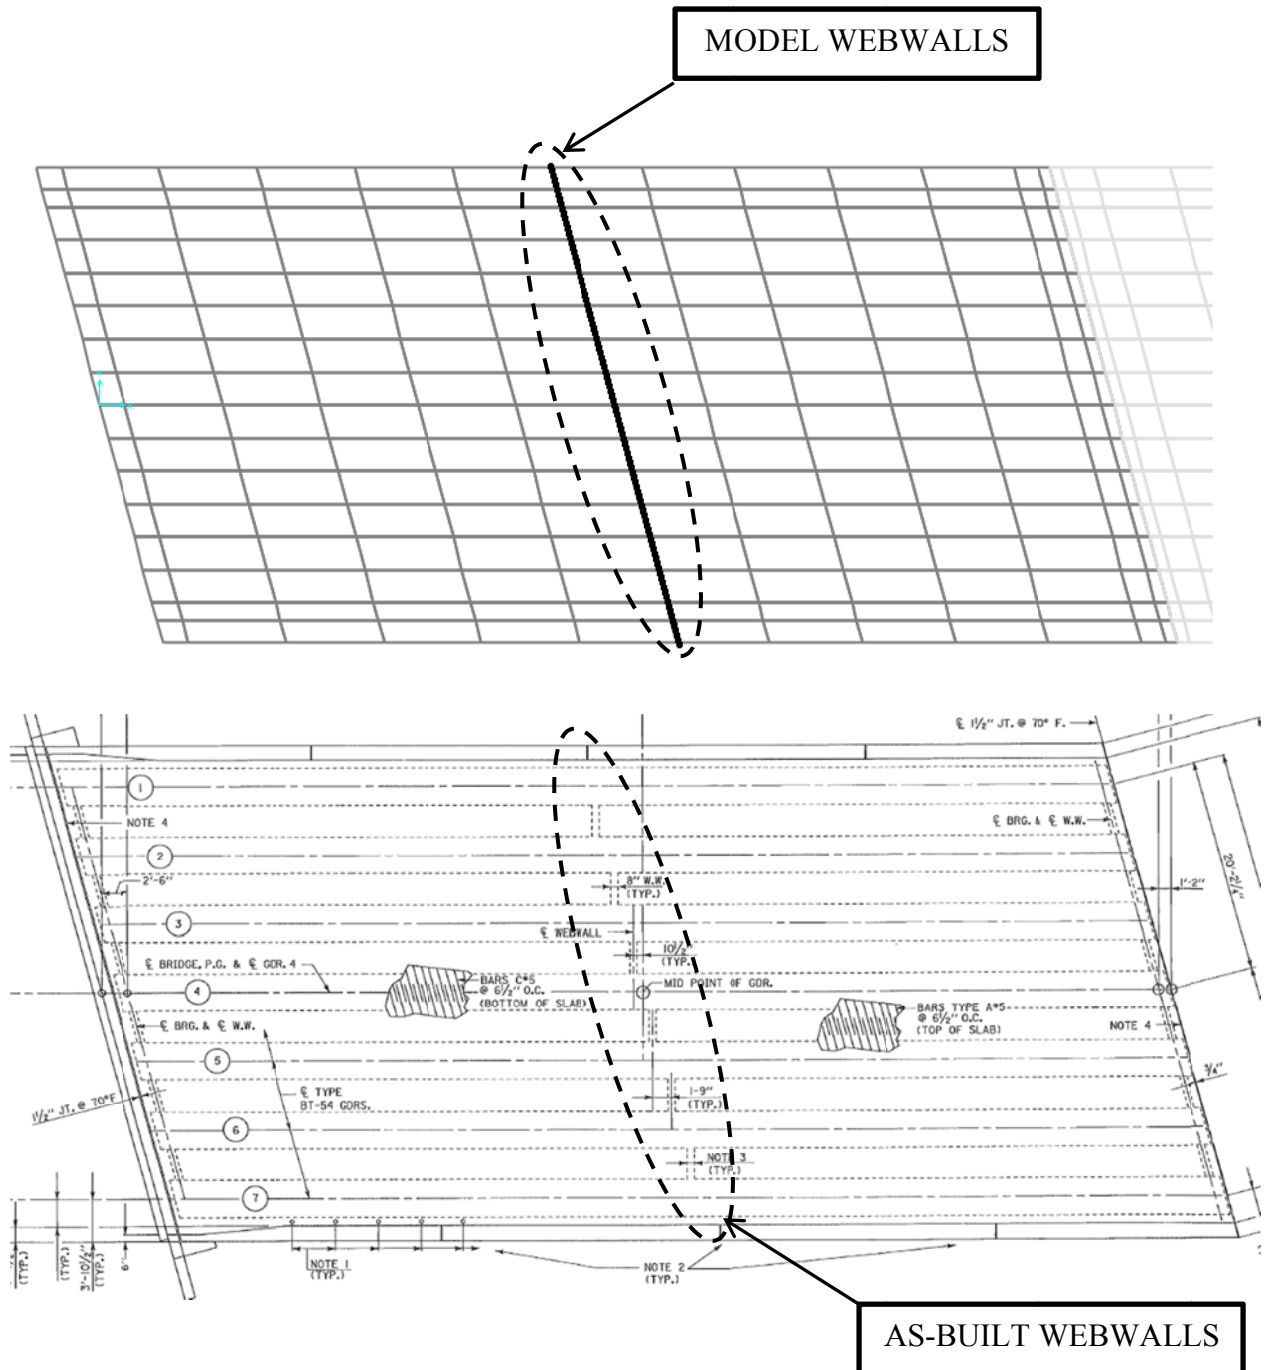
CSiBridge Wizard-defined webwalls and as-built webwalls for span 1 of the bridge.
